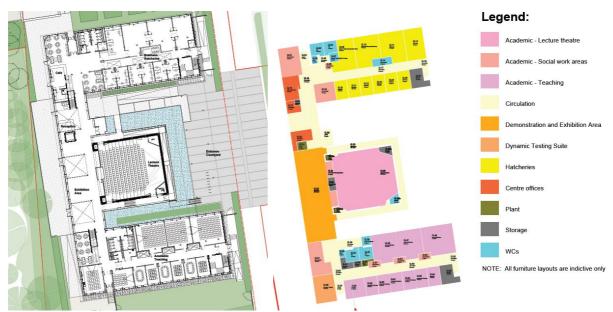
Ground Floor Plan of the NRPEC (Picture courtesy of Architype)
